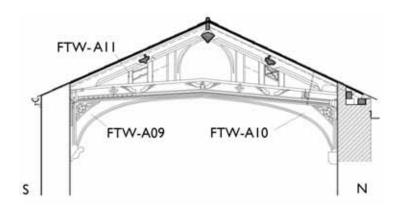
East elevation of principal truss 5 (based on truss 11), showing the location of samples FTW-A09-11 (Freeland Rees Roberts Architects)
